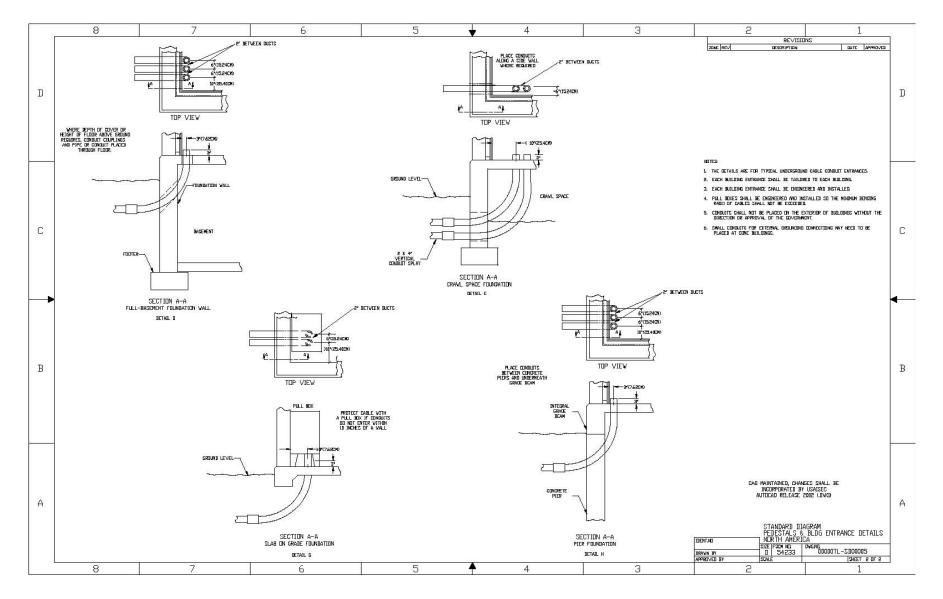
Pedestals and Building Entrance Details – North America (2 of 2)
